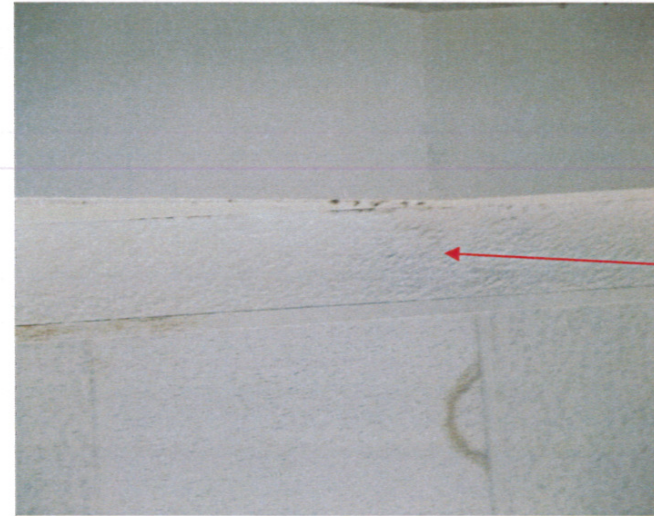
Floors, 2 & 4 Brown Drywall Wall
